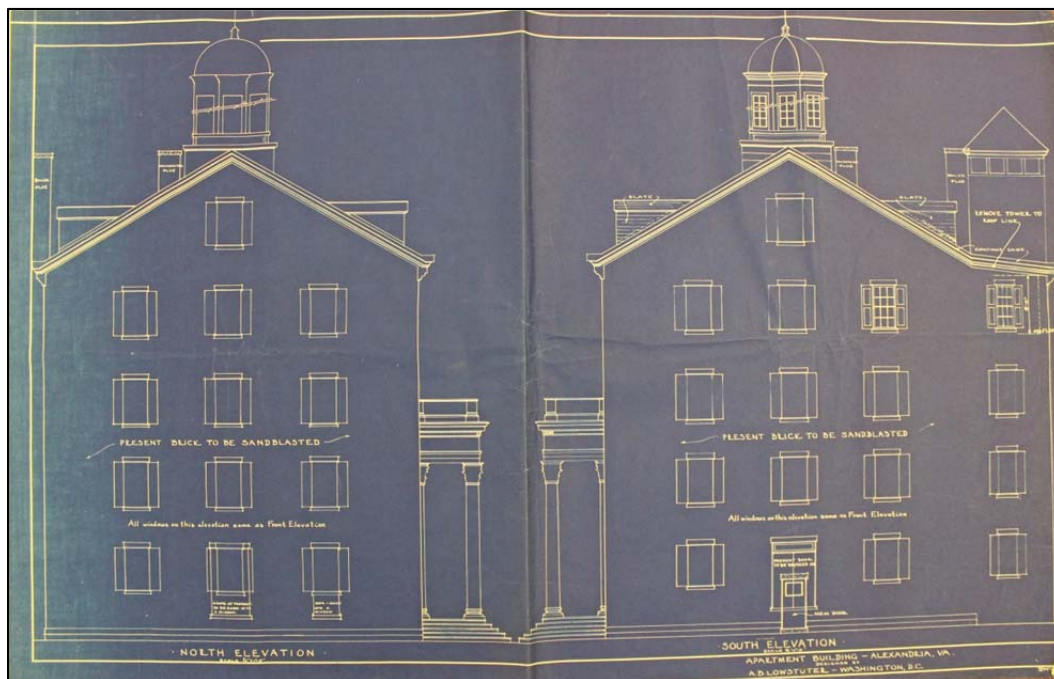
1935 A.B. Lowstuter's Design for Belle Haven Apartments. North and South elevations. Courtesy of Alexandria Local History Special Collections. Drawings note the installation of a new center door on the first floor of the south elevation and the conversion of two doors to windows on the north elevation, as well as demolition of the elevator tower to the height of the roof line.
